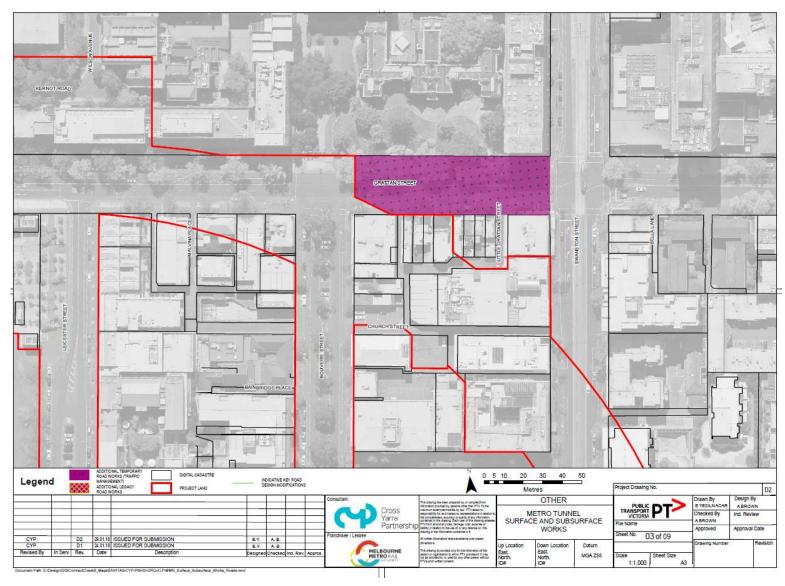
GRATTAN STREET ADDITIONAL ROAD SURFACE WORKS
